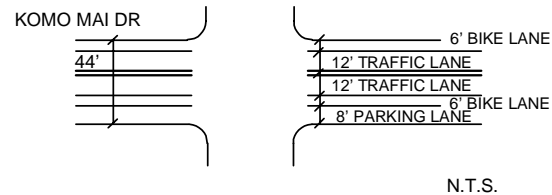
Komo Mai Drive (Diamond Head of Hoohulu Street)
